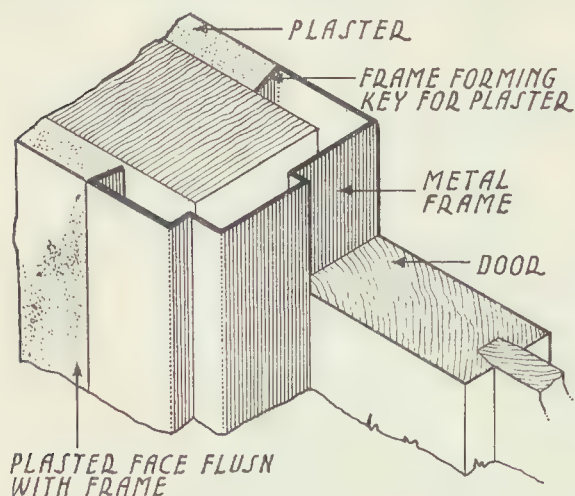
"METAL TRIM" DETAIL OF FRAME
